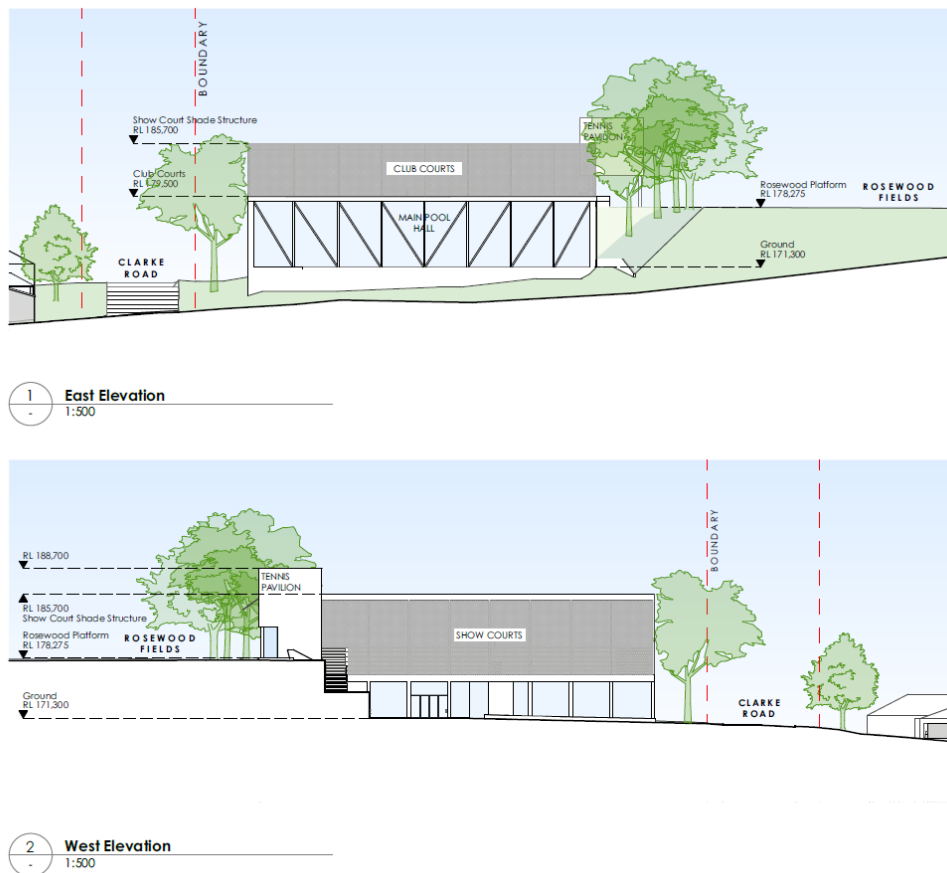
Proposed elevations of the proposed new Aquatics and Tennis Centre at the southeast corner of the main campus site. (Source: Neeson Murcutt + Neille)
